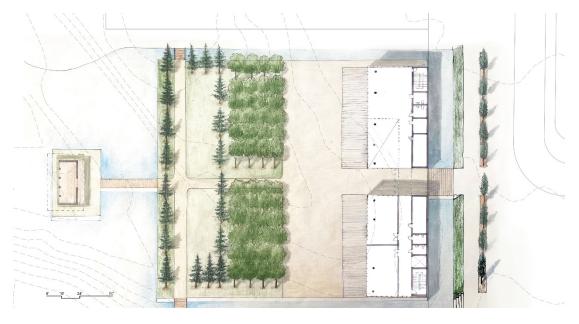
Recreation Center Floor Plan 2 (Source: Author)
